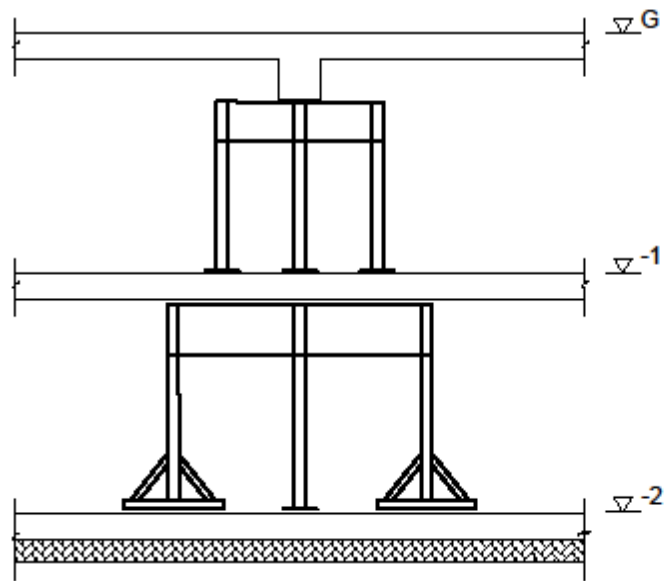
c. Additional props added to allow new foundation to be formed.
